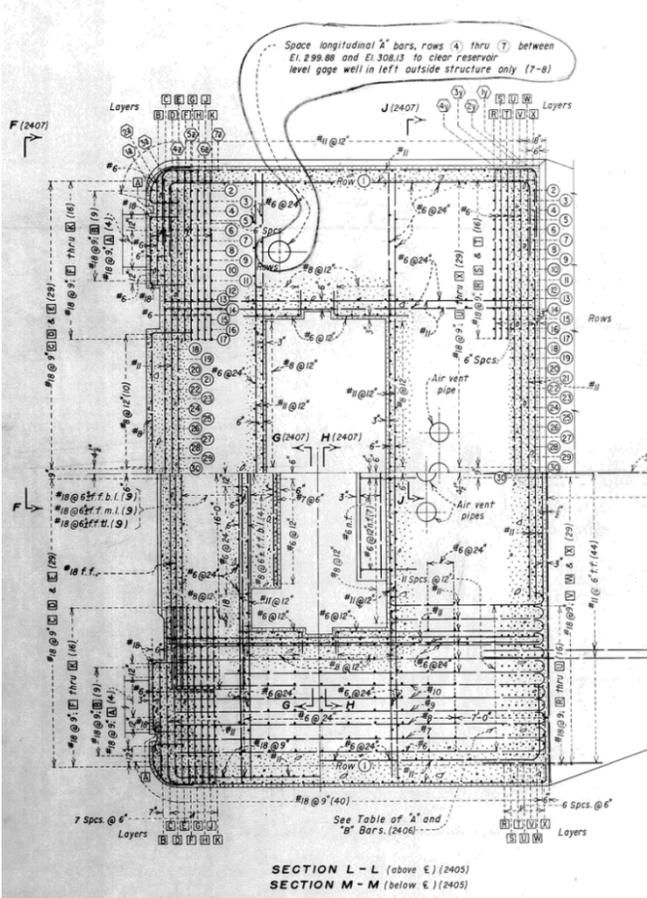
Section through outlet works tower to illustrate difference in longitudinal and transverse reinforcement
